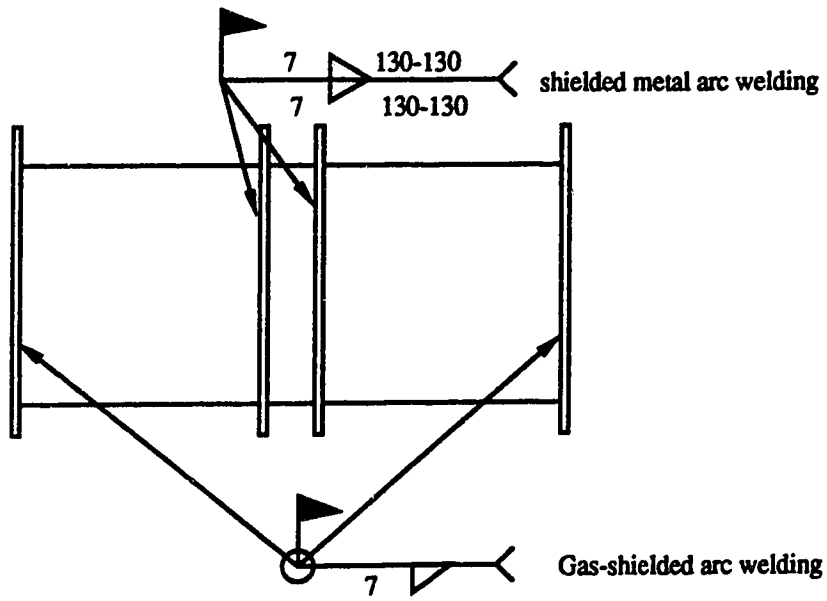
Welding Details at the diaphragms of specimen S1
